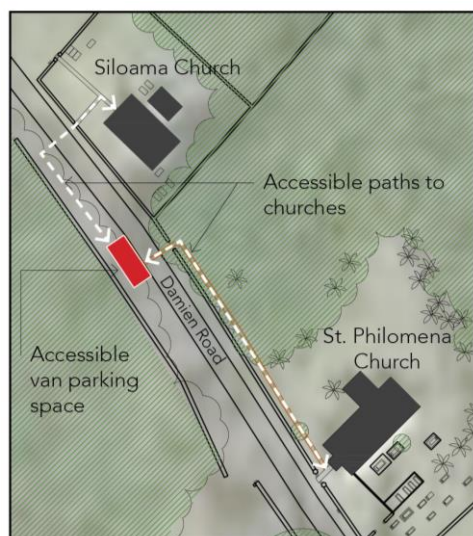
Diagram illustrating the establishment of an accessible parking space between Siloama and St. Philomena Churches and accessible routes to the buildings. (Source: LSHLA)
